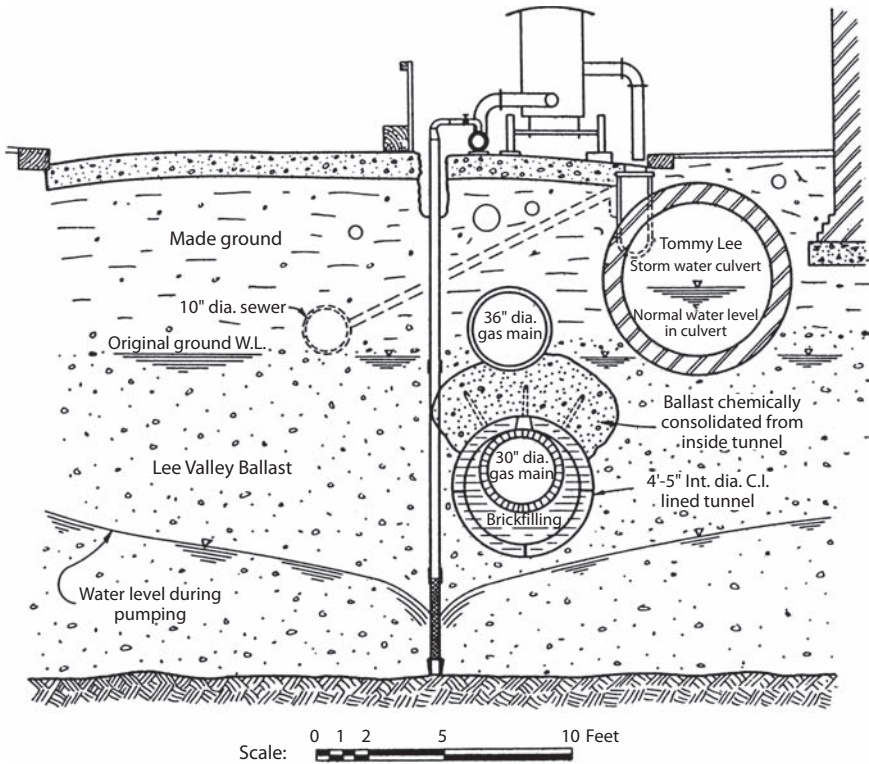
Sewer diversion under a gas main using wellpoints and chemical injections. This shows an early British wellpoint application on the Bow–Leyton extension of the London Underground central line in the 1930s. The dewatering allowed tunnel works beneath an existing gas main. (From Harding, H.J.B., *Tunnelling History and My Own Involvement*. Golder Associates, Toronto, Canada, 1981. Courtesy of Golder Associates.)
